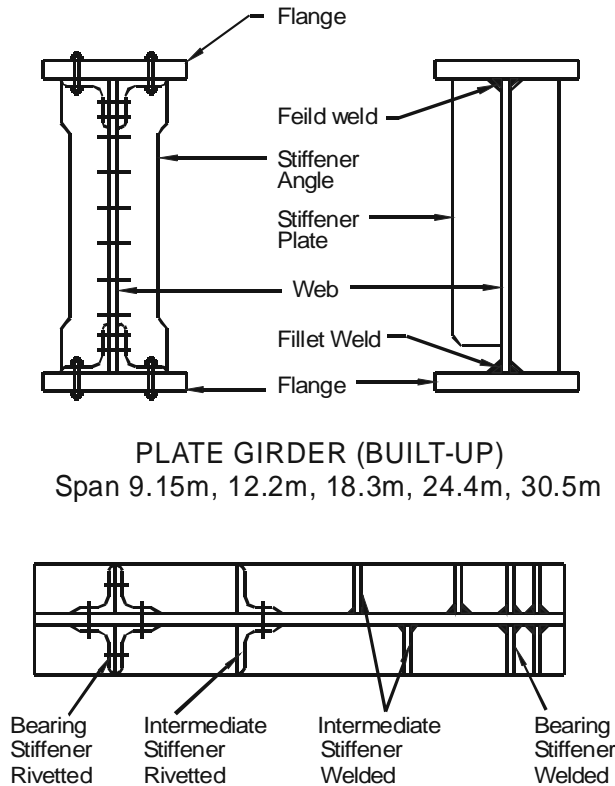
Typical welded and riveted girder cross sections
